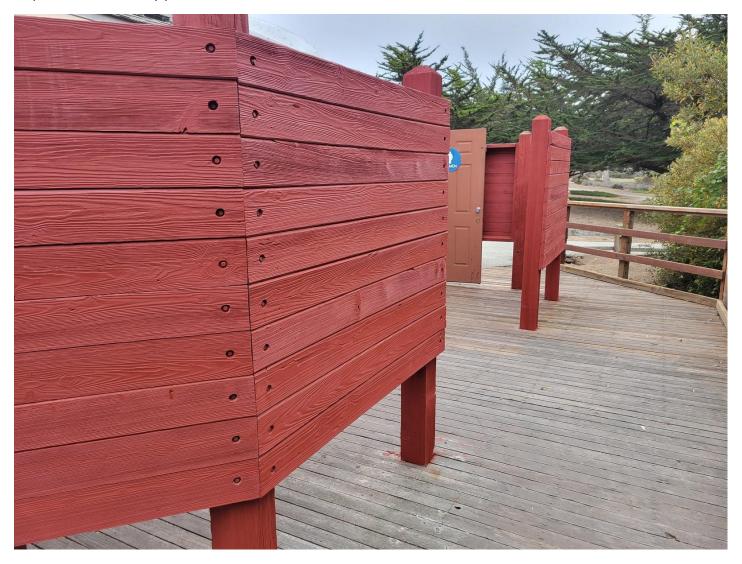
Below photo shows north wall of restrooms to the right, and east wall (proposed for mural) on the left.
